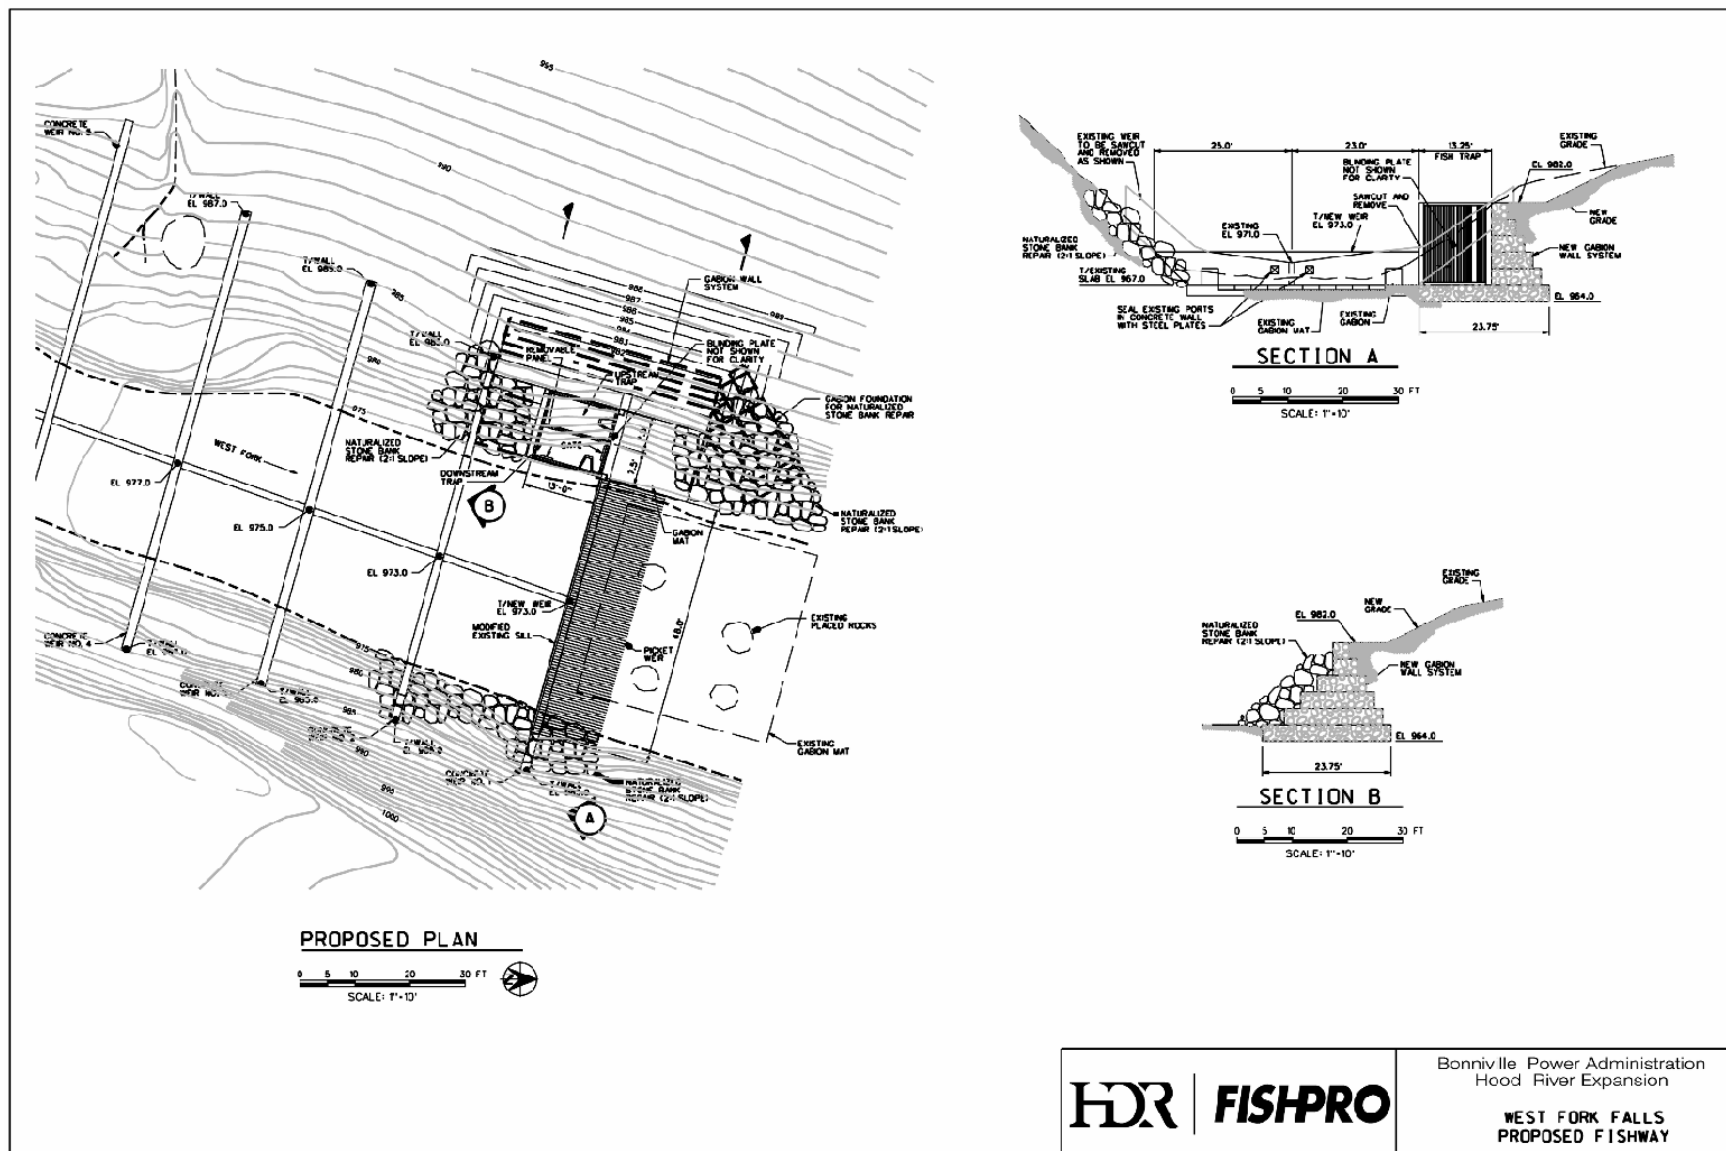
Typical Removable Sill RBW System with Trap Proposed at the West Fork Location
